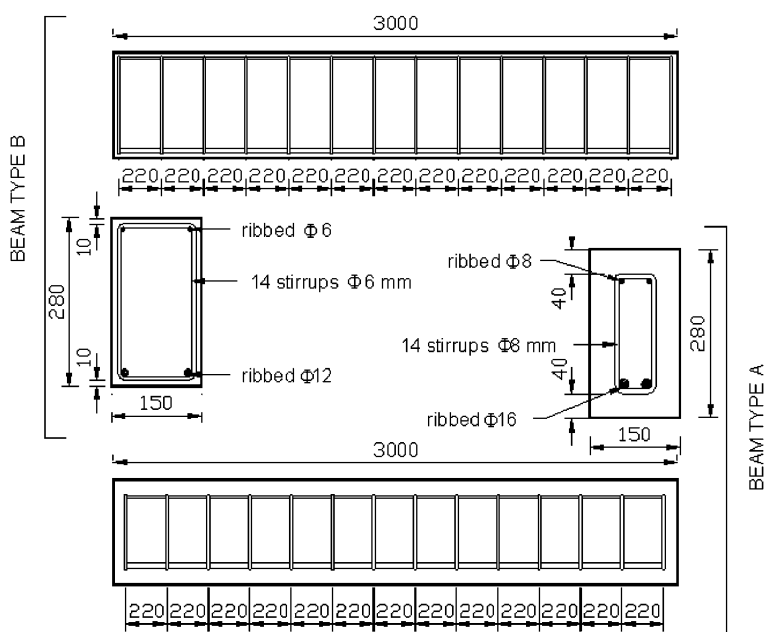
Lay-out of the reinforcement (all dimensions in mm) for types A and B beams.
